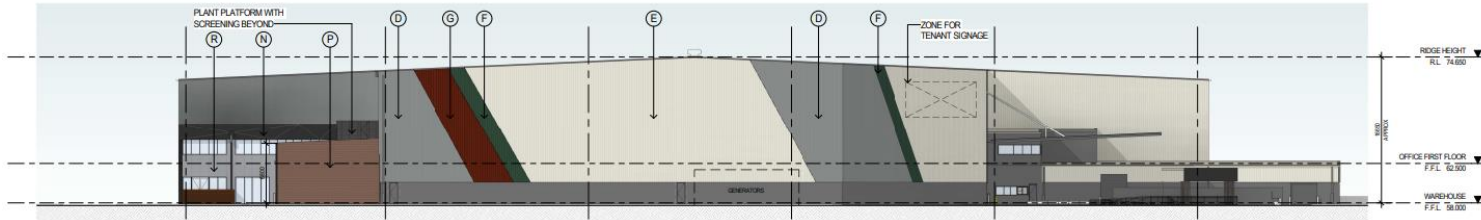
Proposed Northern Elevation (Source: Watson Young)
